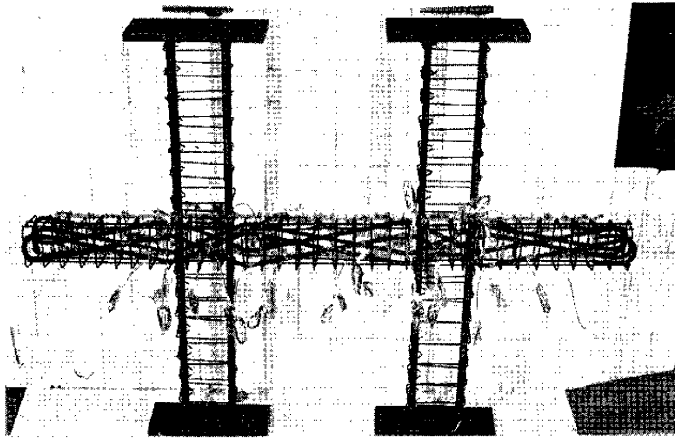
Arrangement of Reinforcement (Specimen XX)
